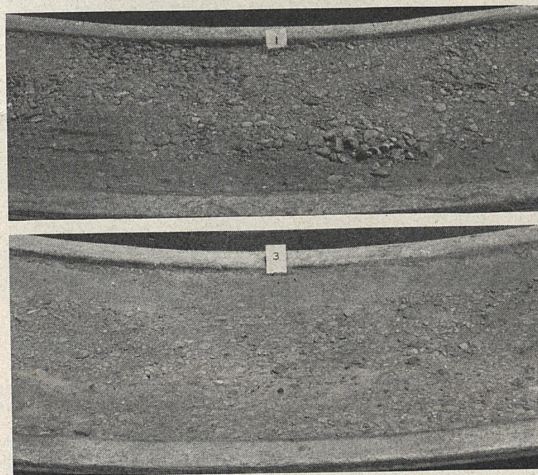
SECTIONS OF TRACK 3 AT 160,000 WHEEL-TRIPS, JUST BEFORE THE FIRST SPRINKLING. UPPER, SECTION 1, WHICH IS ALSO REPRESENTATIVE OF SECTION 2; LOWER, SECTION 3. SECTIONS 4 AND 5 WERE IN SLIGHTLY BETTER CONDITION THAN SECTION 3.
